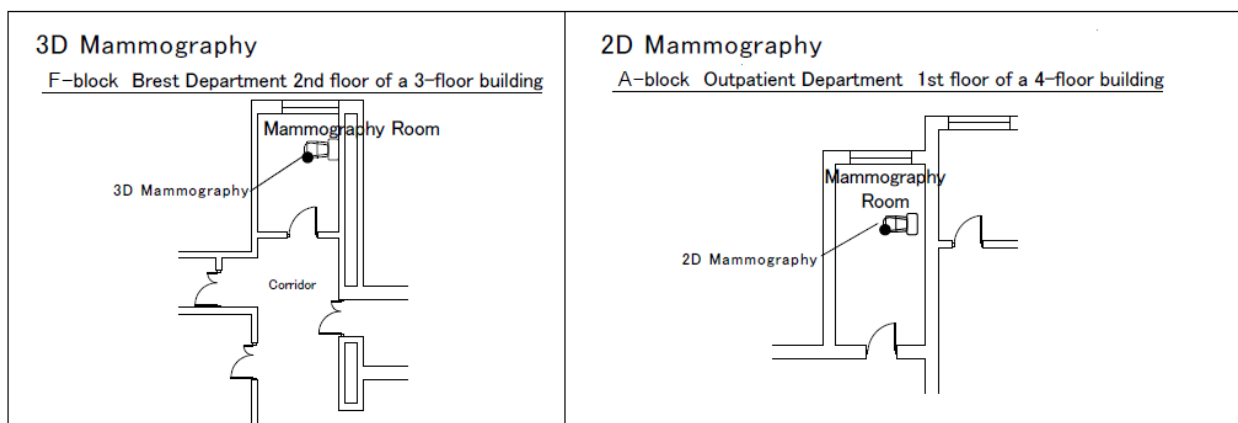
Floor Plan and Equipment Layout (NCOH)
